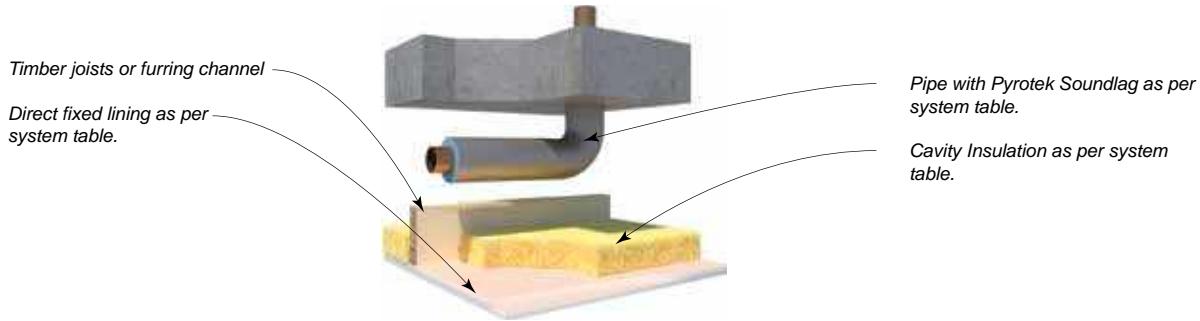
WALL/CEILING SYSTEMS FOR WASTE PIPE IN CEILING – WITH WALL LINED ONE SIDE
